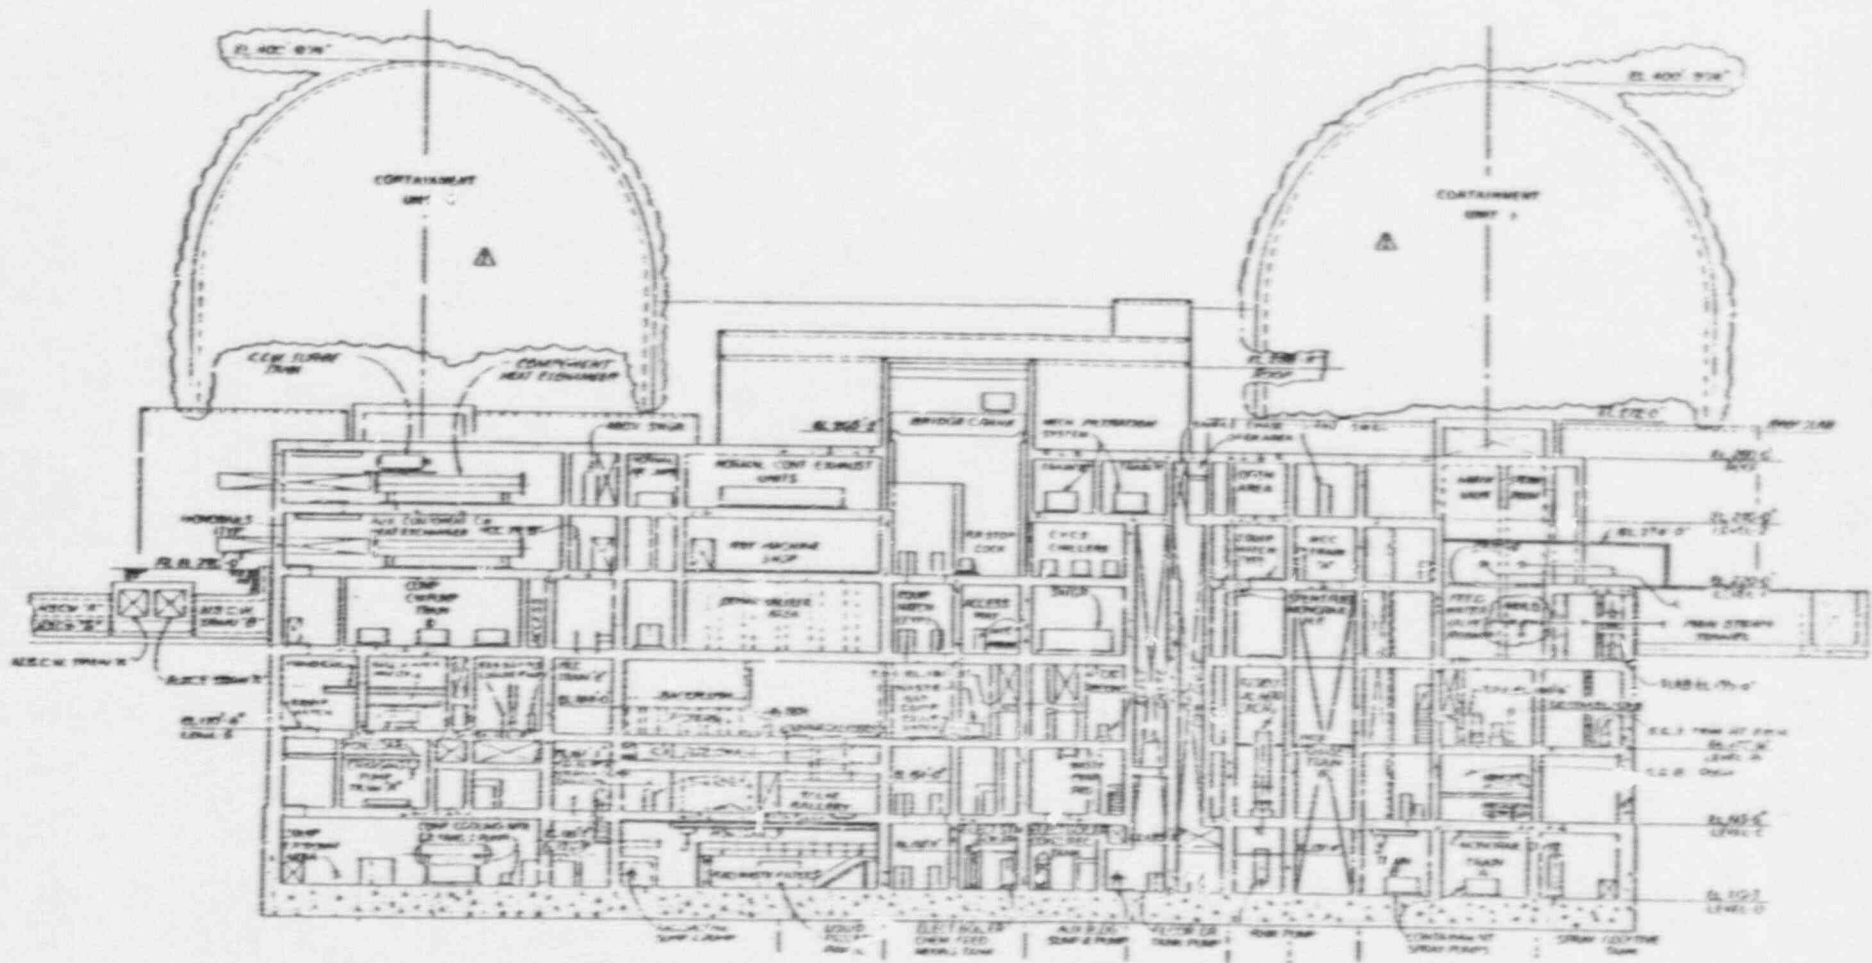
Vogtle 1 and 2 General Arrangement, Looking North
